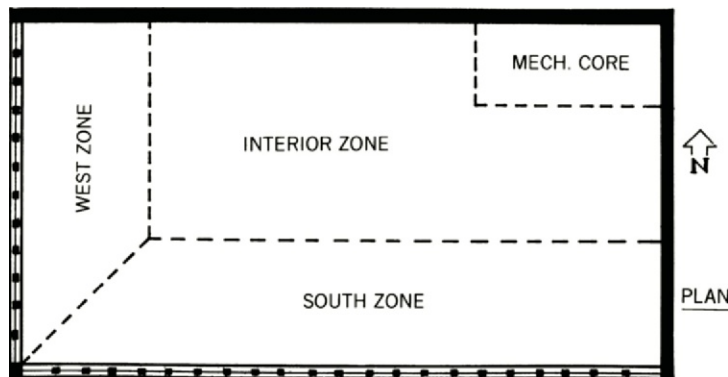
A special three-zone floor plan is used to illustrate the major mechanical systems available for large buildings. This plan could represent the southwest quadrant of a typical large office building.
